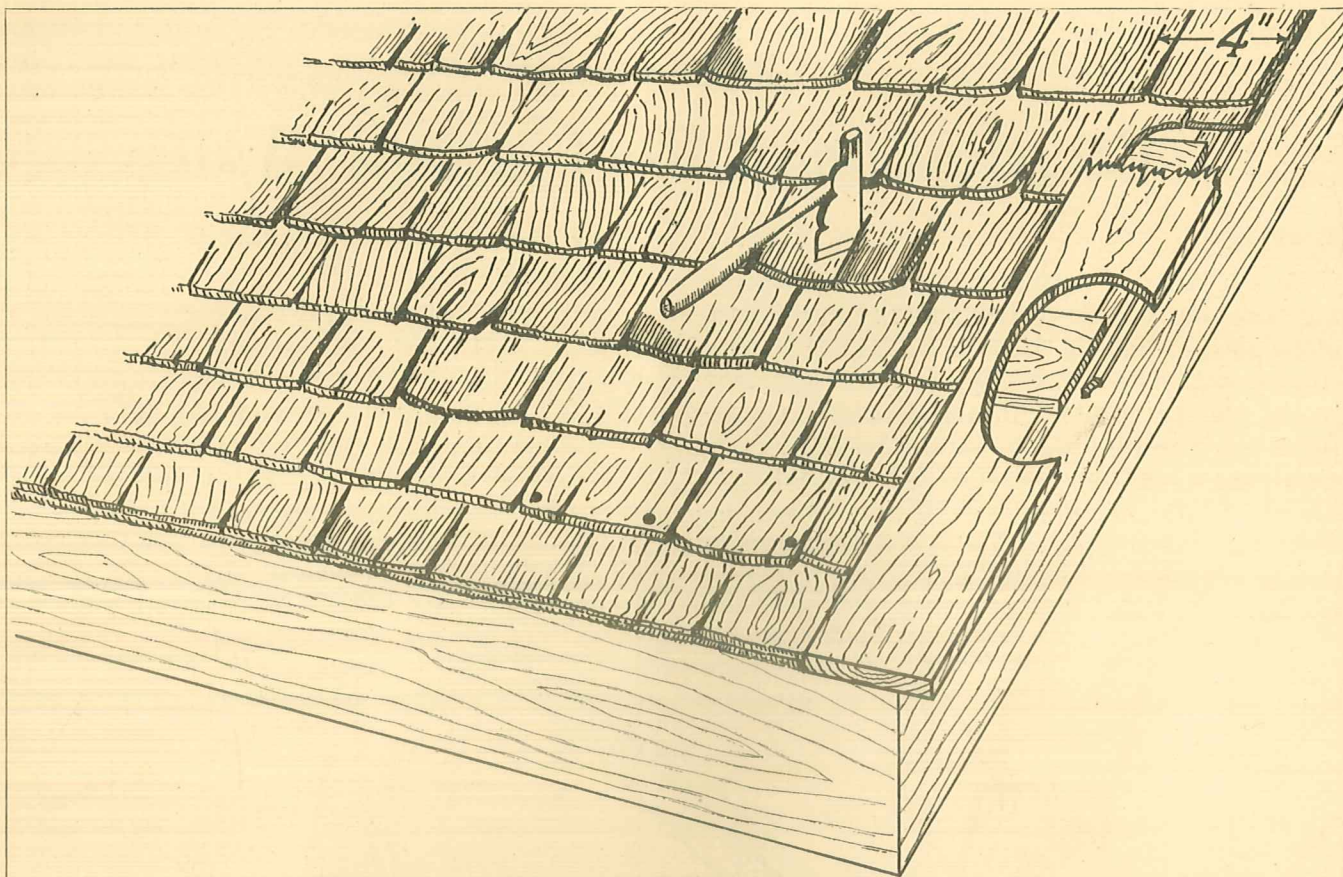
In preparing old roof for re-roofing split warped shingles with a hatchet and nail them down. Lay new gable strip
